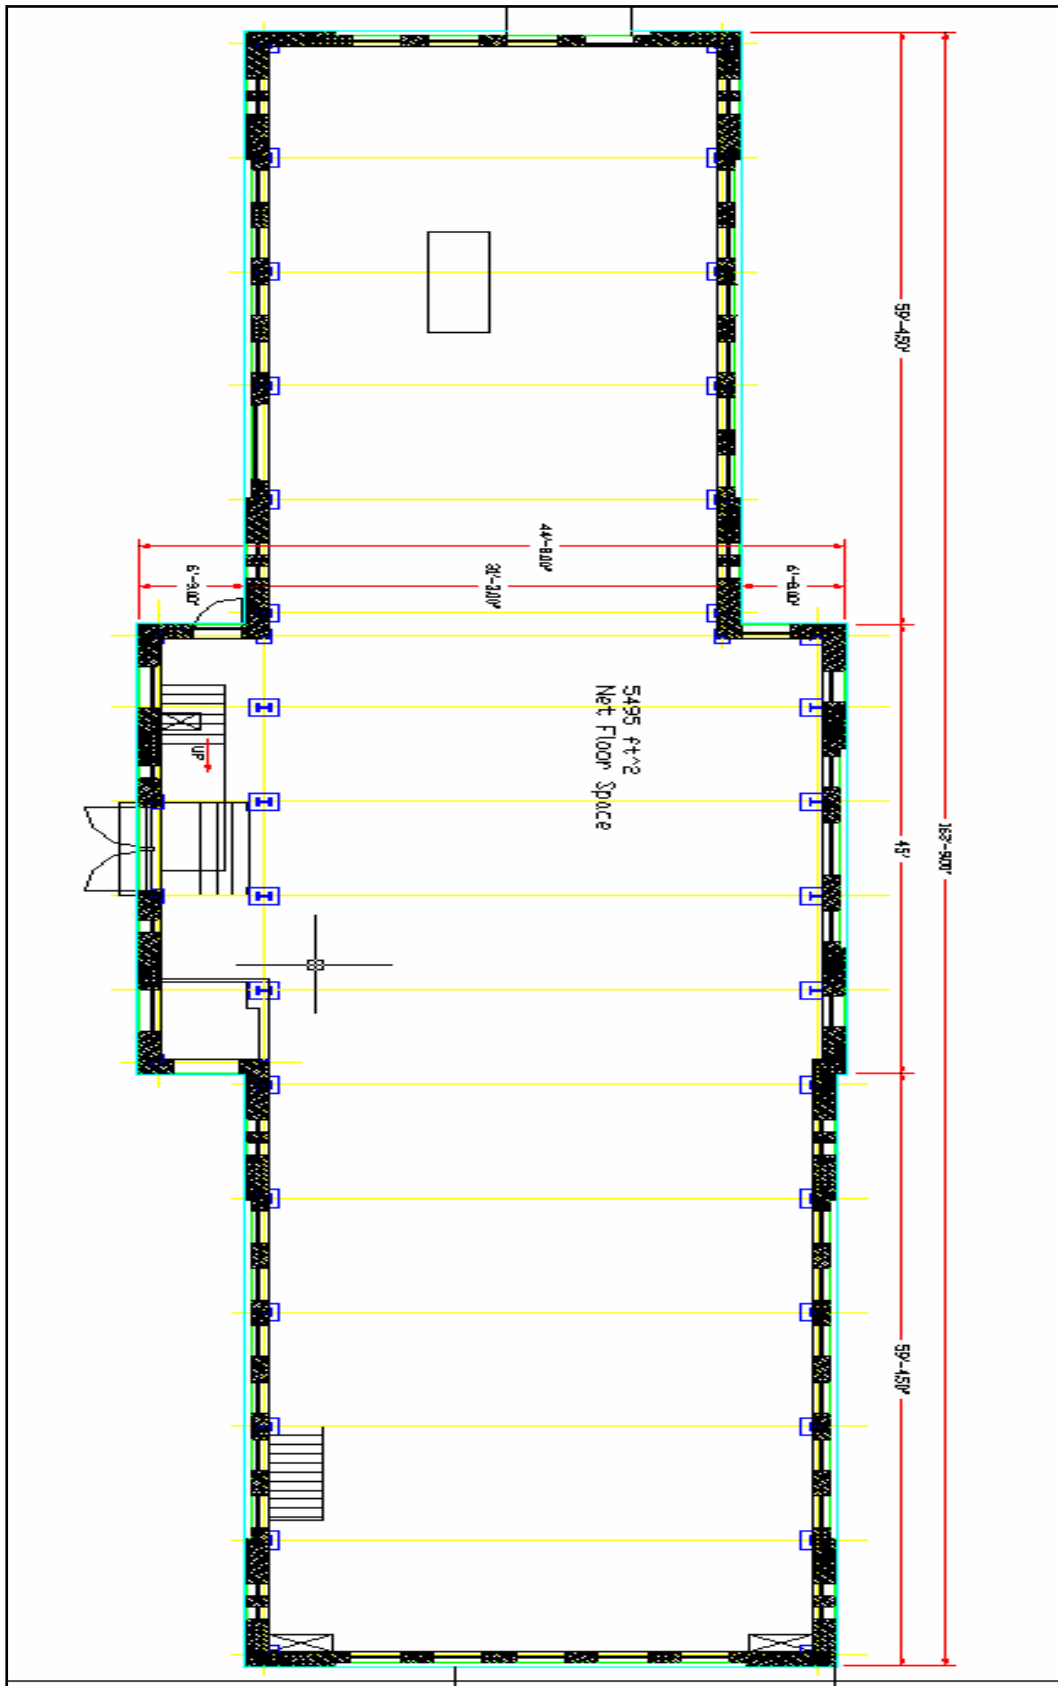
An AutoCAD diagram of the IIHR floor plan.
